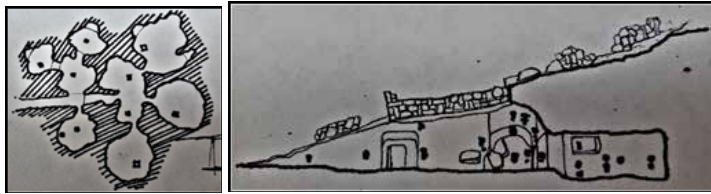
A dwelling unit in Meymand Village; left: plan; right: section, low ceilings, niches dug in the walls, simplicity of the interiors, and priority of public life over private one⁶⁰
